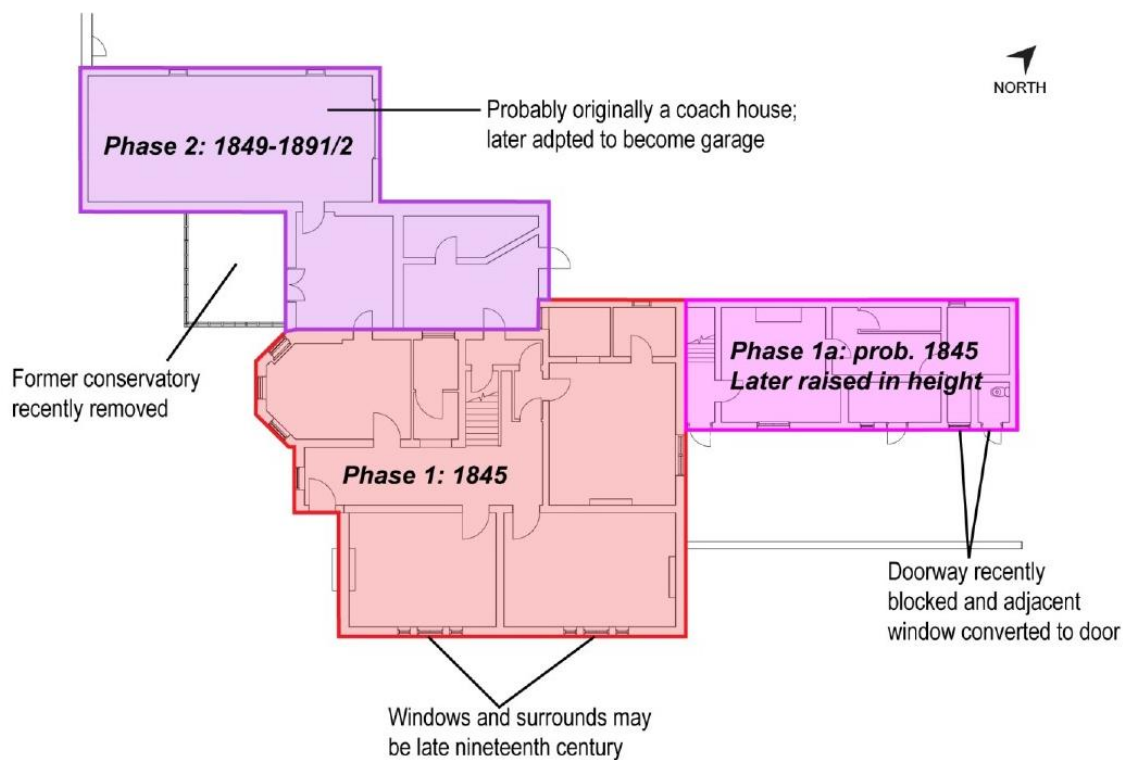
Phased plan of Park Hall (courtesy of Humble Heritage)
